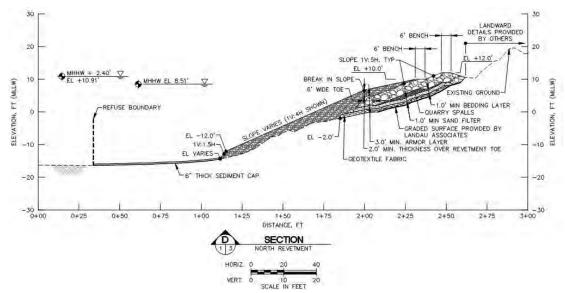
Typical cross-section of north gravel cobble beach with revetment
